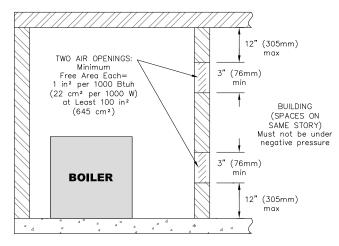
Air Openings – All Air from Indoors on the Same Floor
